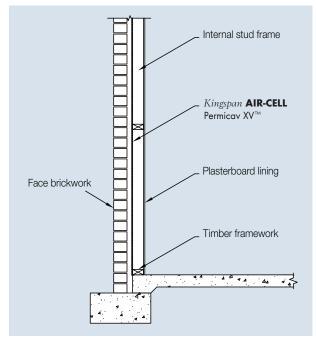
Side elevation of Kingspan AIR-CELL Permicav XV $^{\text{\tiny{TM}}}$ in brick veneer wall
